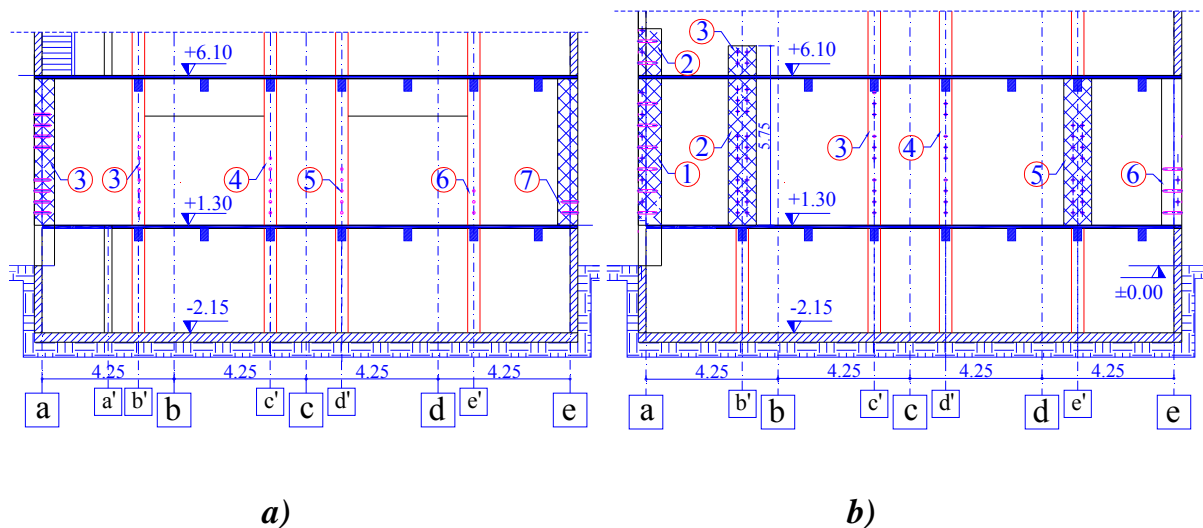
Explosions steps: a) for axis 7 and b) for axis 8
